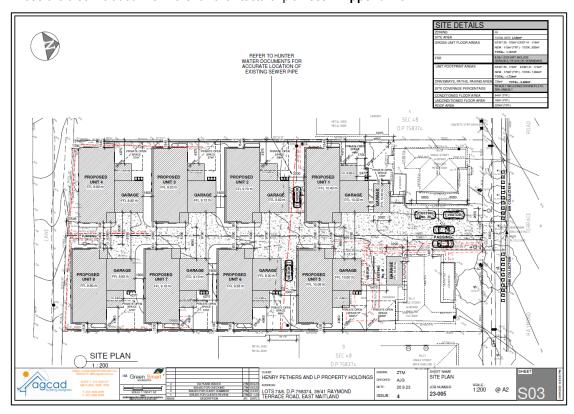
Proposed Site Plans (source: AGCAD Building Designers)
